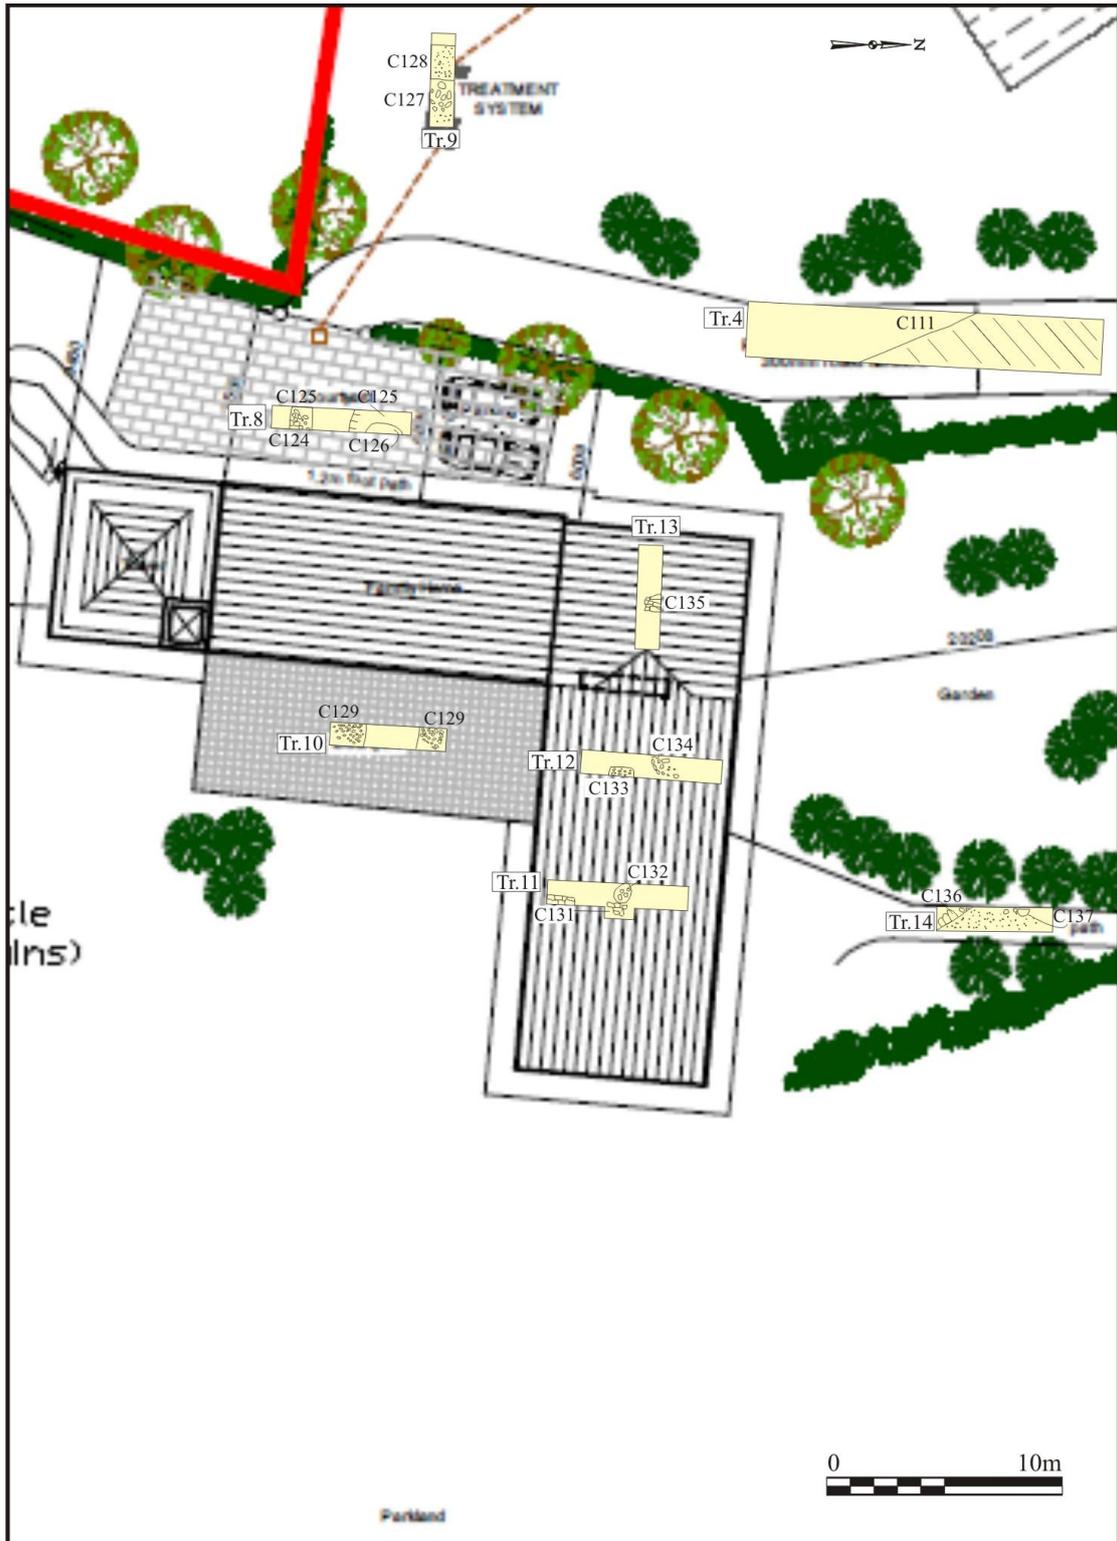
Location & layout of archaeological test trenches and features within building complex
